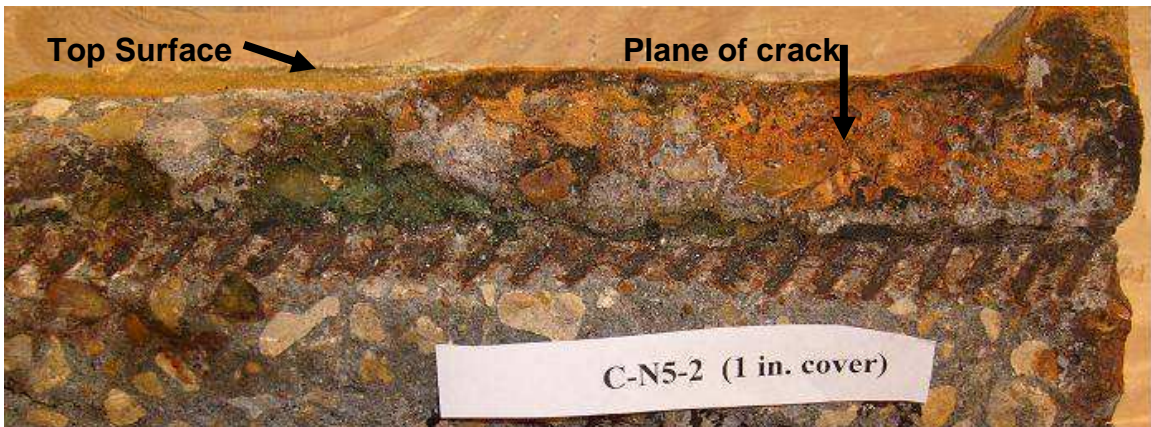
Specimen Conv.-2, 25-mm (1-in.) cover. Side view; plane of crack visible above reinforcement. Photos taken immediately after autopsy.
